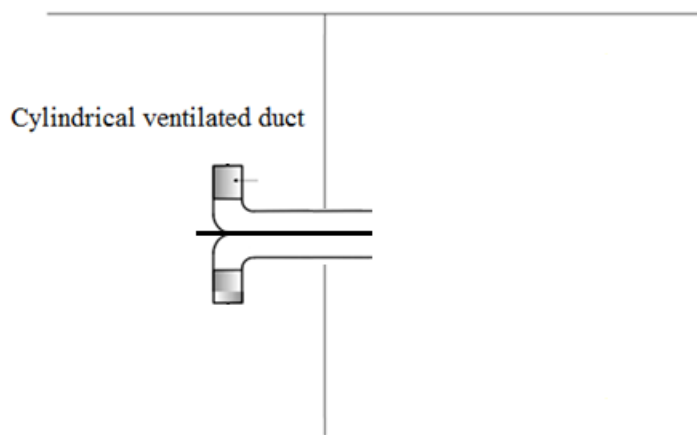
3 Rounded-inlet cylindrical ducts with wing wall design.
